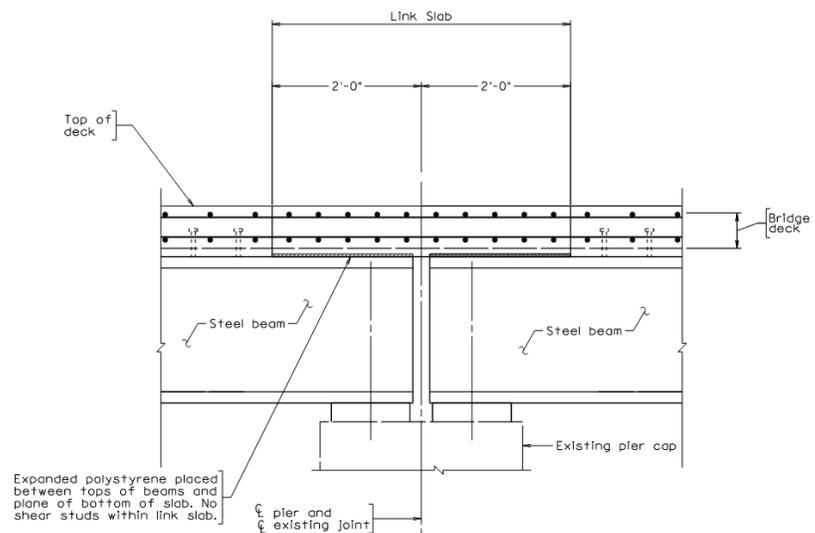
Link Slab Detail for E. Broad Street Bridge
